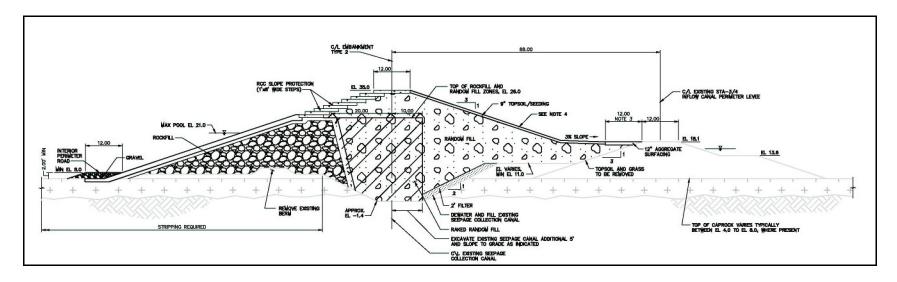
Embankment Section Adjacent to Supply Canal Levee North of STA-3/4 (No Scale)
